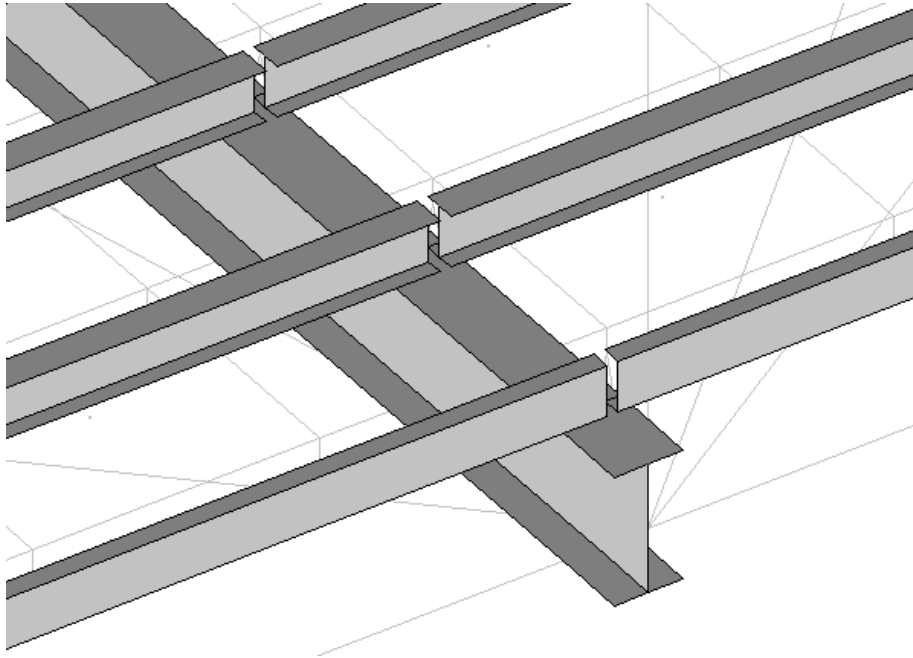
Blue River Bridge. Rendering of steel stringers on steel floor beam.
